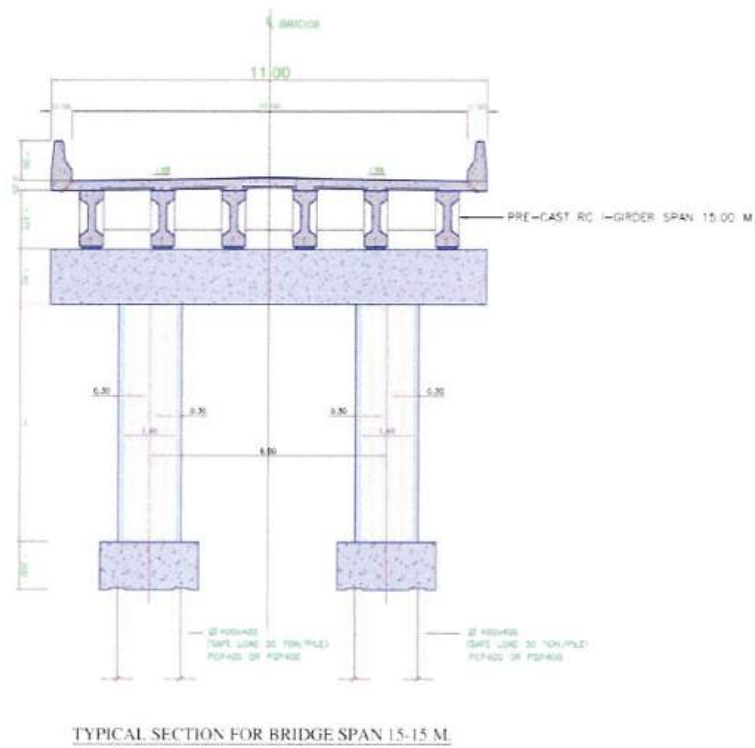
STRUCTURAL SCHEME PRECAST RC I-GIRDER 15 M SPAN BRIDGE
